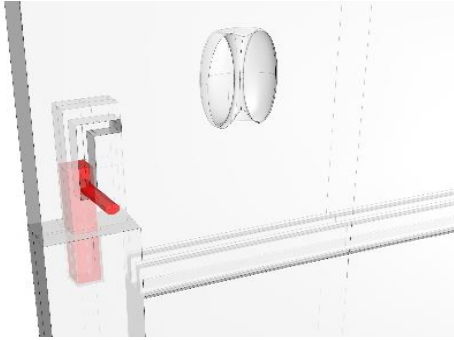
shows one possible design to realize this connection, in which a simple peg is used to connect the panel halves at the point where there is a rail stop.
